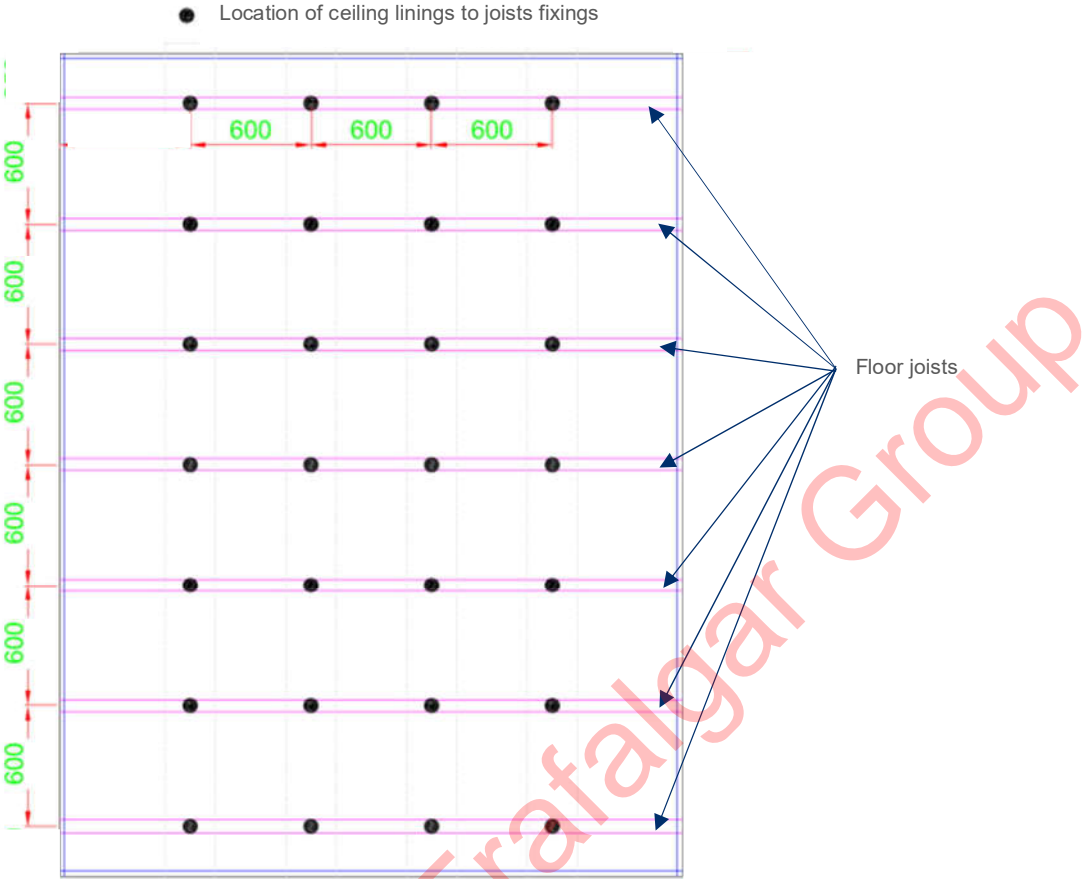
A1 COREX ceiling linings to floor joists fixing locations
